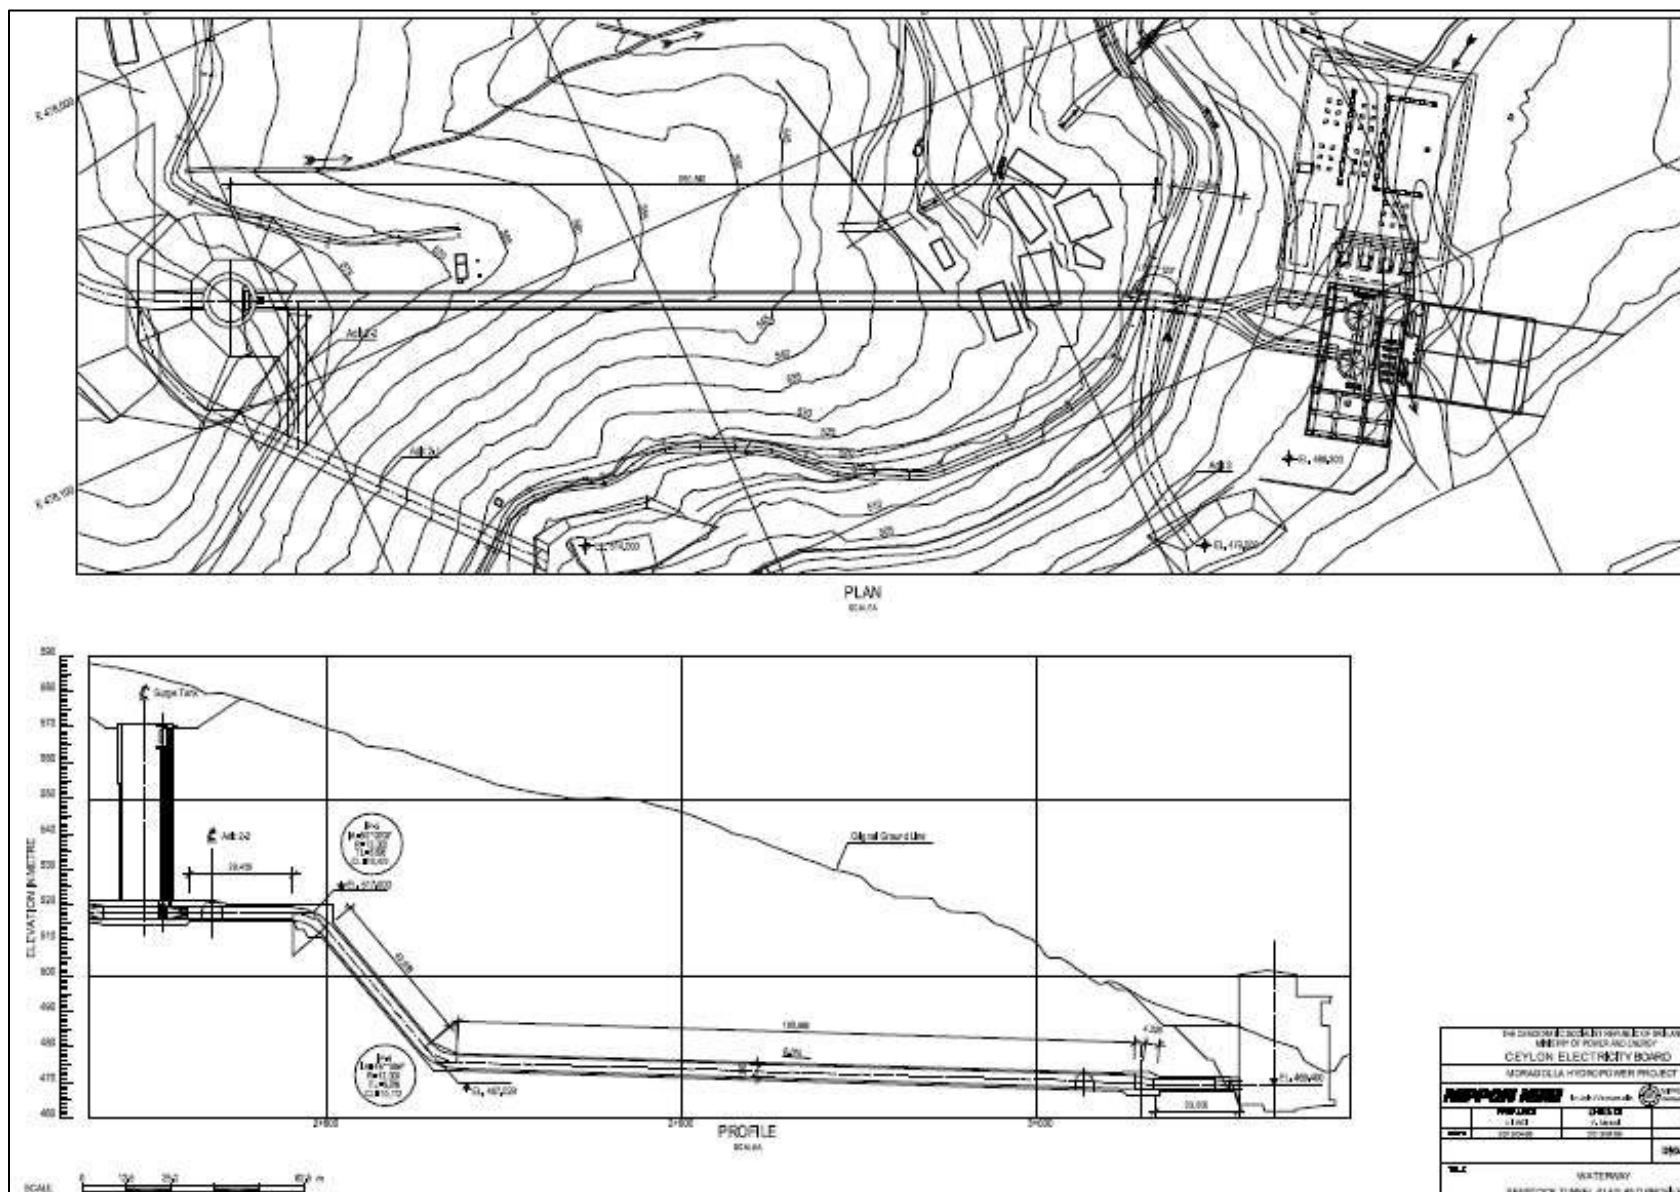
Plan and profile of the headrace tunnel (downstream), surge tank, penstock and tailrace outfall
